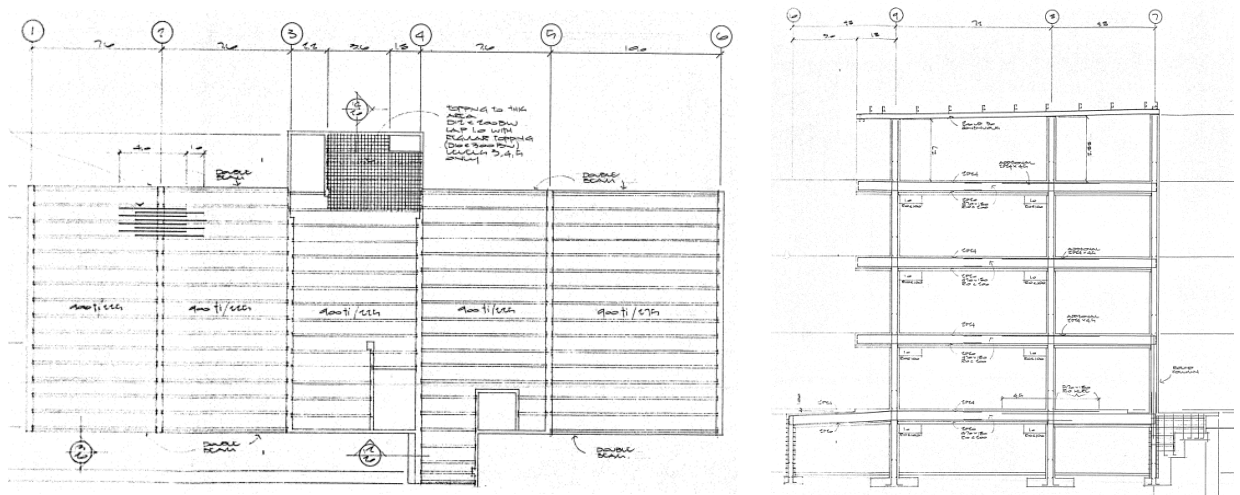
Left; 3rd floor plan showing the building grid layout referred to in the analysis results and the locations of the lift and stair service cores within the building and external stairs at the western end of the building.
